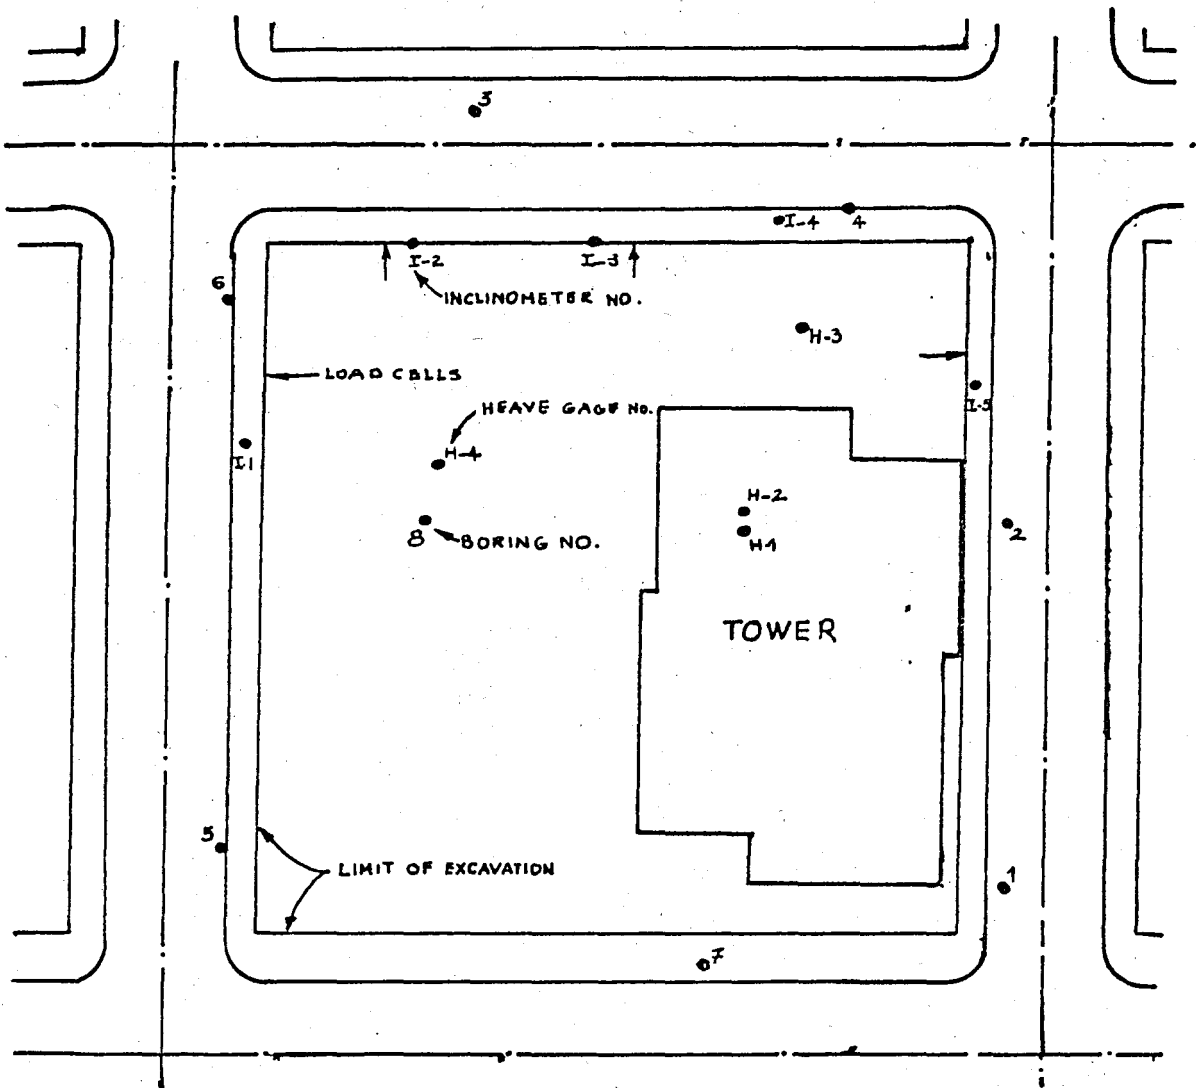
Site Plan, Tied-Back Wall, Case No. 1
